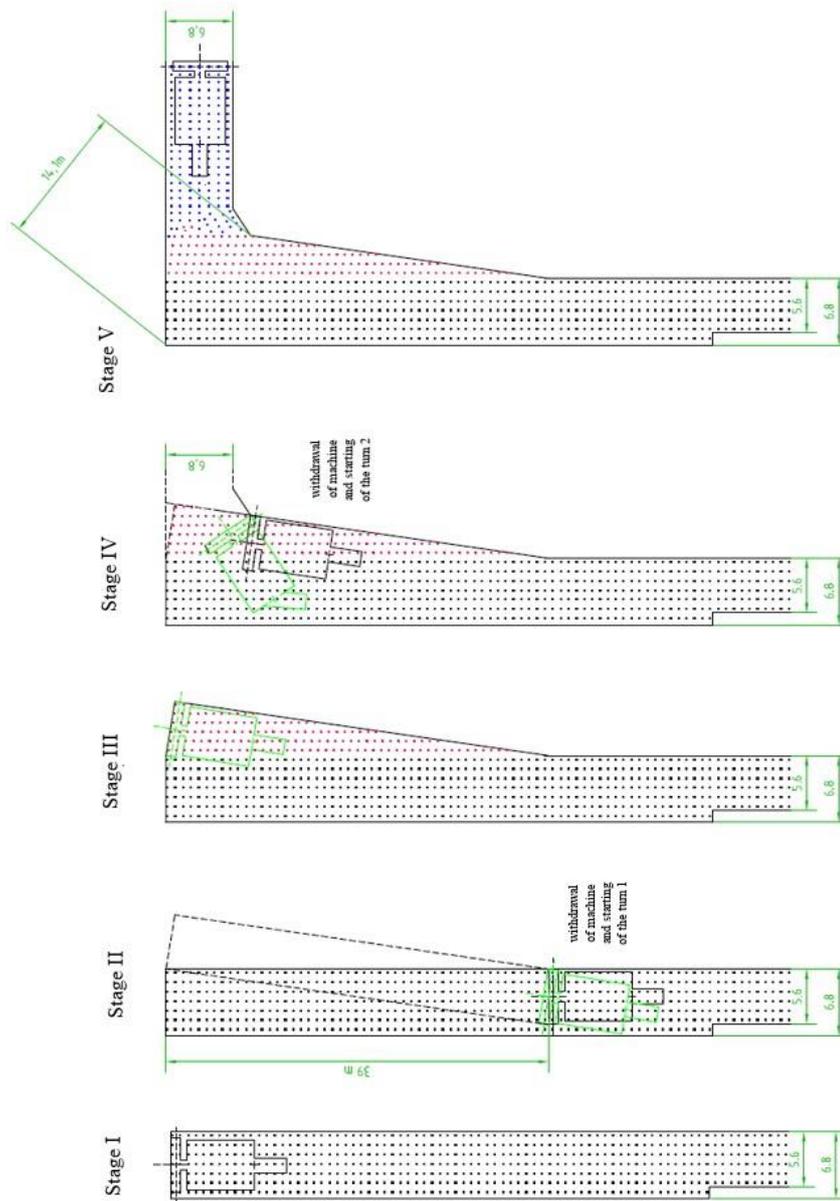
Schematic diagram of driving the bend at the angle of 90° with a long departure - 39 m and with a wide (6.8 m) inlet to a new working
